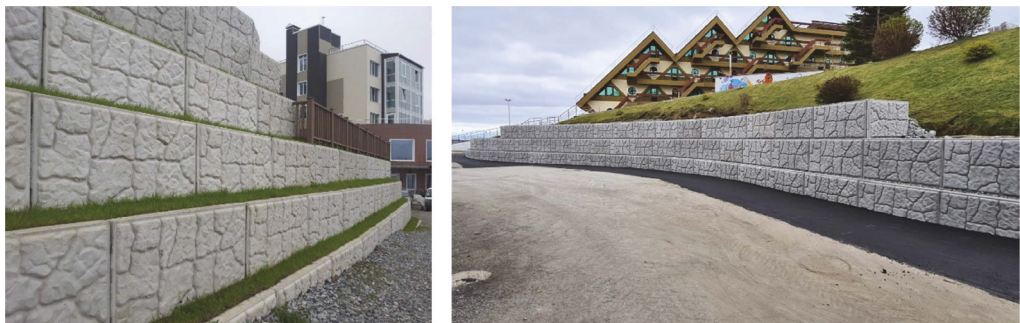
Retaining structures comprised of infilled blocks with greening (Vladivostok, Russia).
